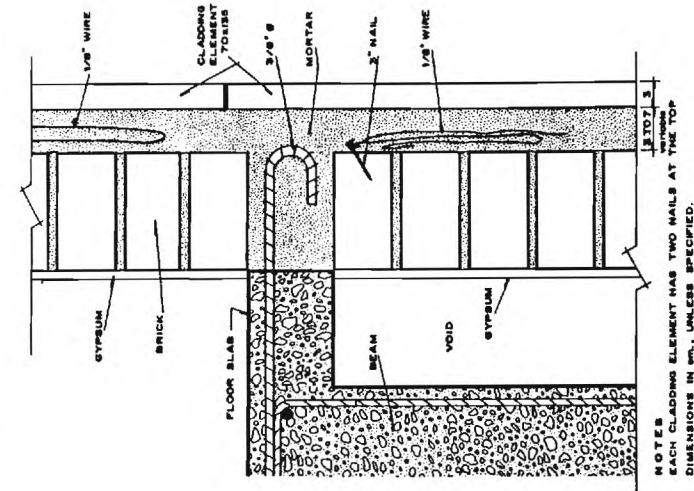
Detail of Cladding Panel Attached to Infill Wall Using Reinforced Mortar
